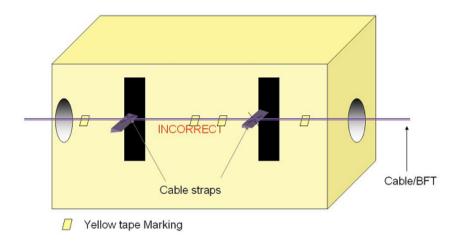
Barckets & bearers are useable, cable/BFT/Sub-duct (less than 25mm) supported on brackets. Incorrect.
